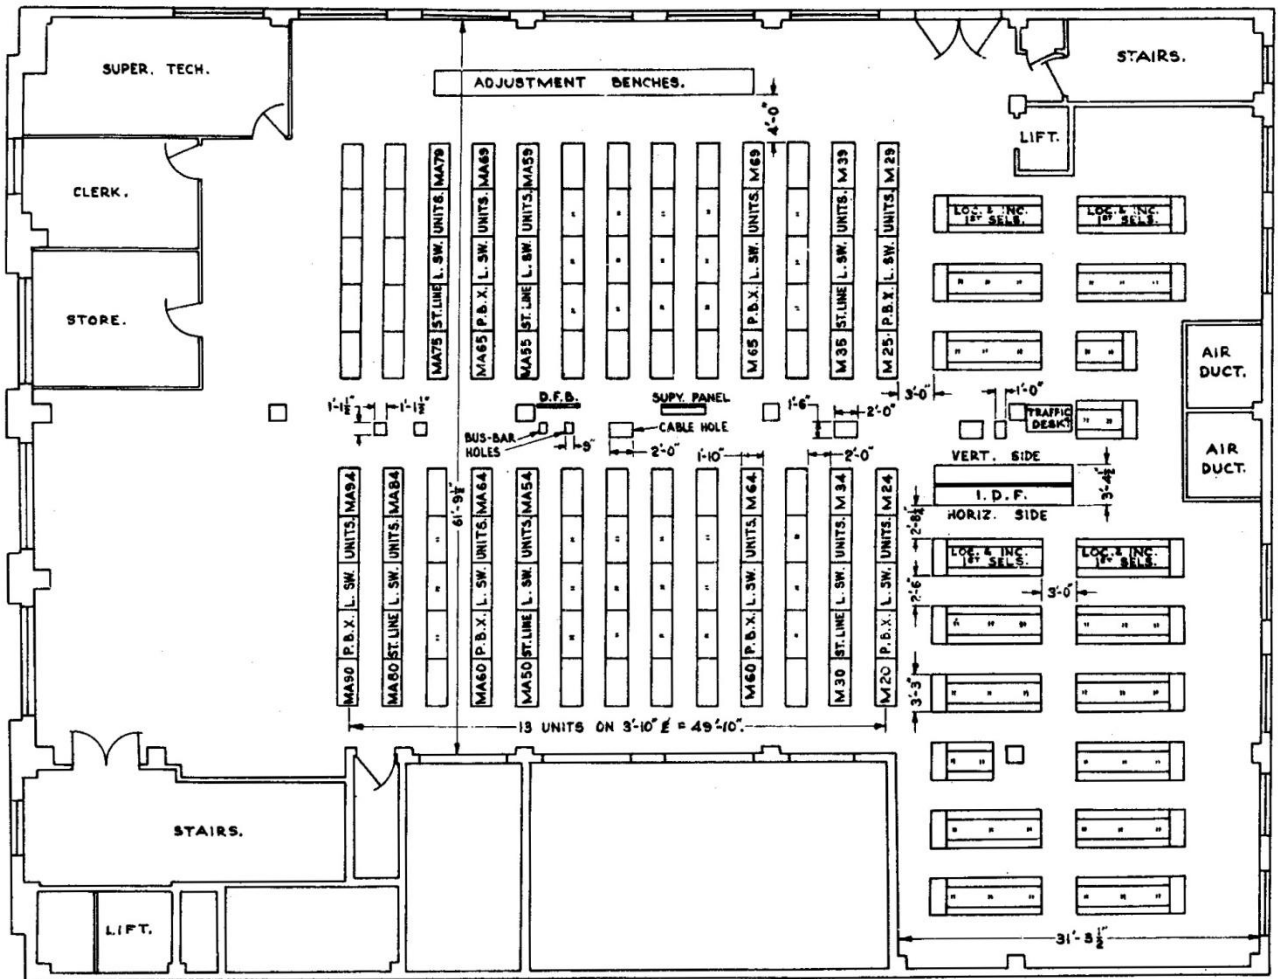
PRE-2000 TYPE LAYOUTS. DIMENSIONS OF AISLES AND PASSAGEWAYS.
